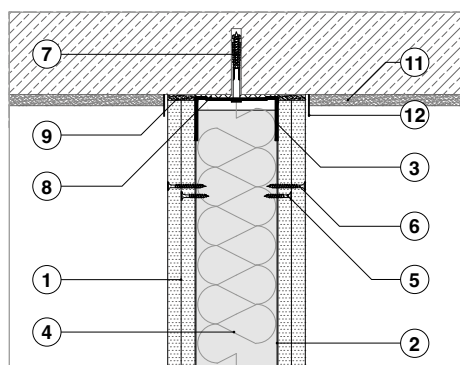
Connecting a partition wall with a ceiling, and securing boards before applying plaster
